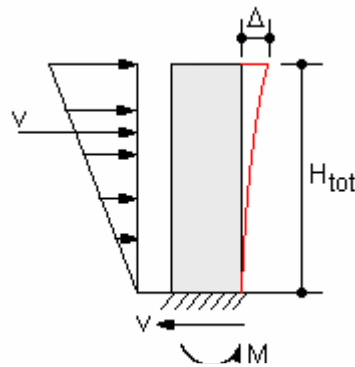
Cantilever wall with triangularly distributed horizontal forces
